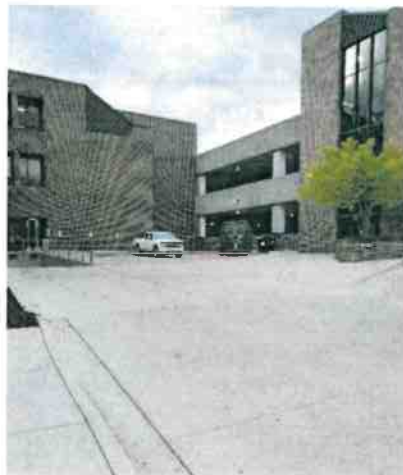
South Side Gannon Deck – looking northwest at structure and Gannon building
